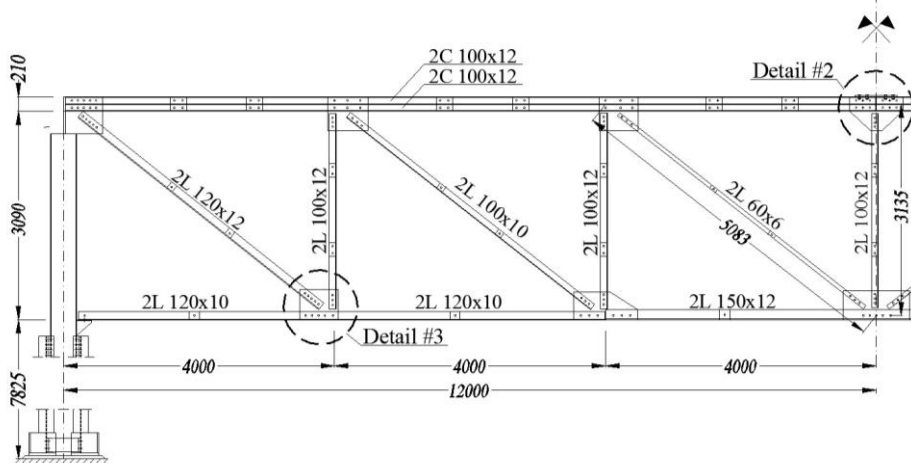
Single-bay structural cross-sections of main frame trusses in direction *Y*.
